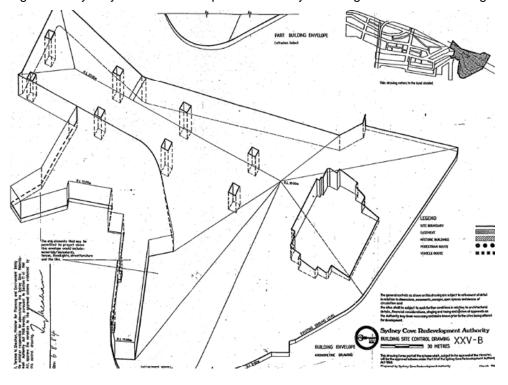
Sydney Cove Redevelopment Authority- Building Site Control Drawing XXV-B- 2 June 1998
